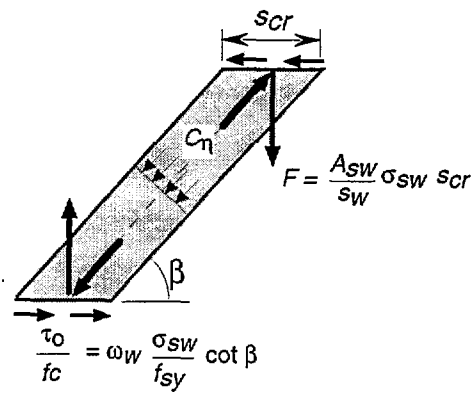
Forces and concrete stress in strut between cracks due to truss action (adapted from Reineck 1991a)
